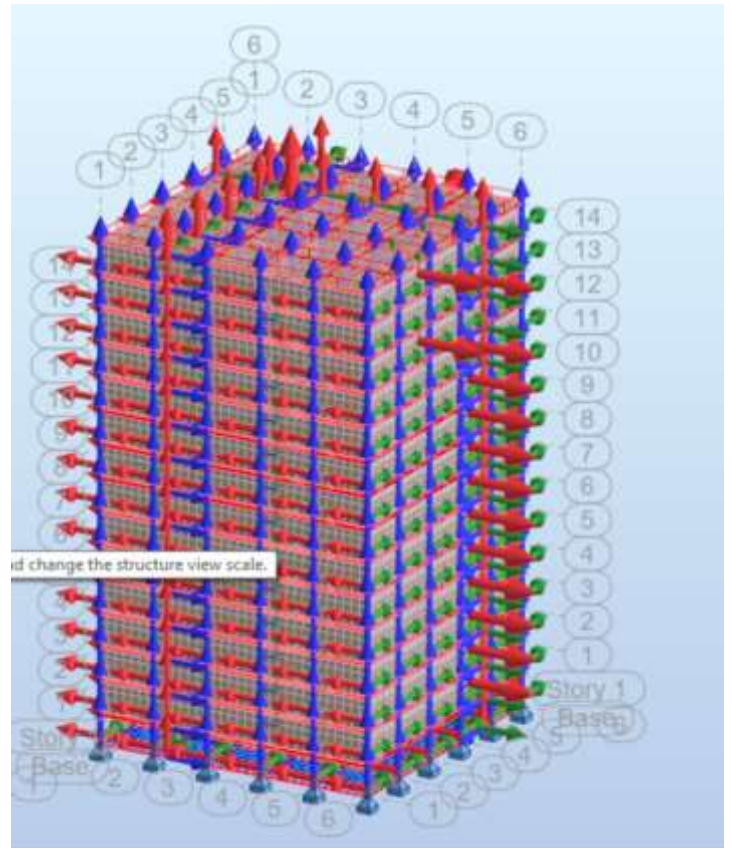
COMPLETELY MESHEd, LOADED BUILDING WITH LOCAL SYSTEM.
